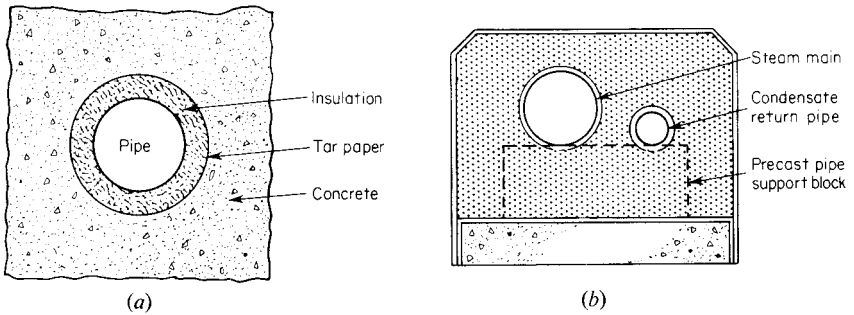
Solid-pour protection for underground steam pipe: (a) insulated and wrapped pipe in structural concrete; (b) pipe is surrounded by insulating concrete.
